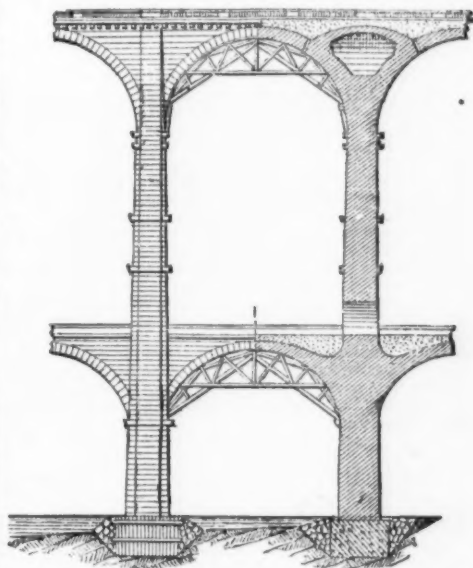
LONGITUDINAL ELEVATION AND SECTION OF TWO CONSECUTIVE PIERS.
